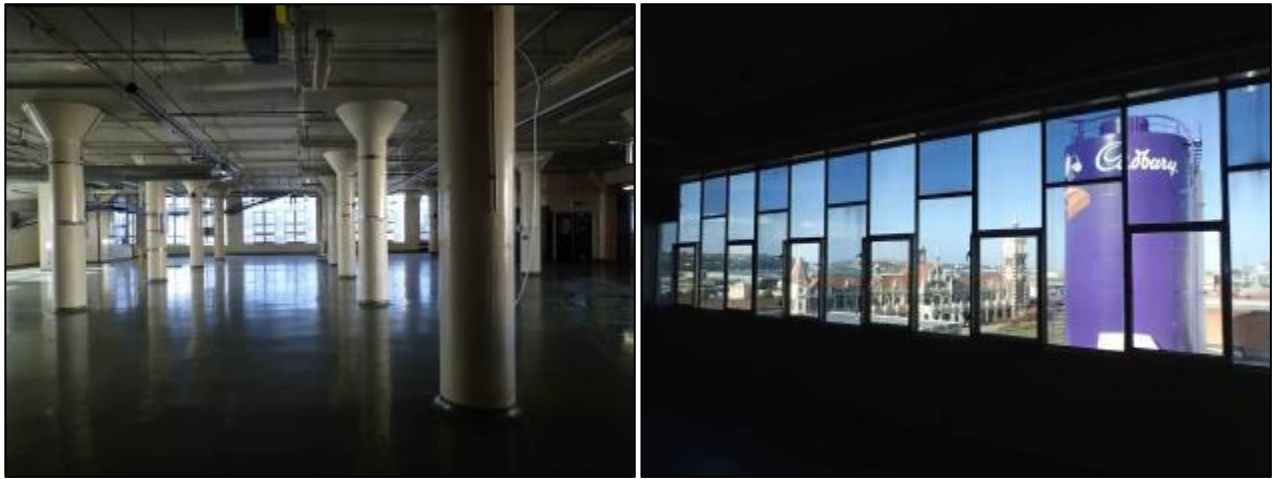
Photograph looking east (left) at windows on the second floor (Block 5C); looking southeast (right) at windows on the third floor (Block 5C).
